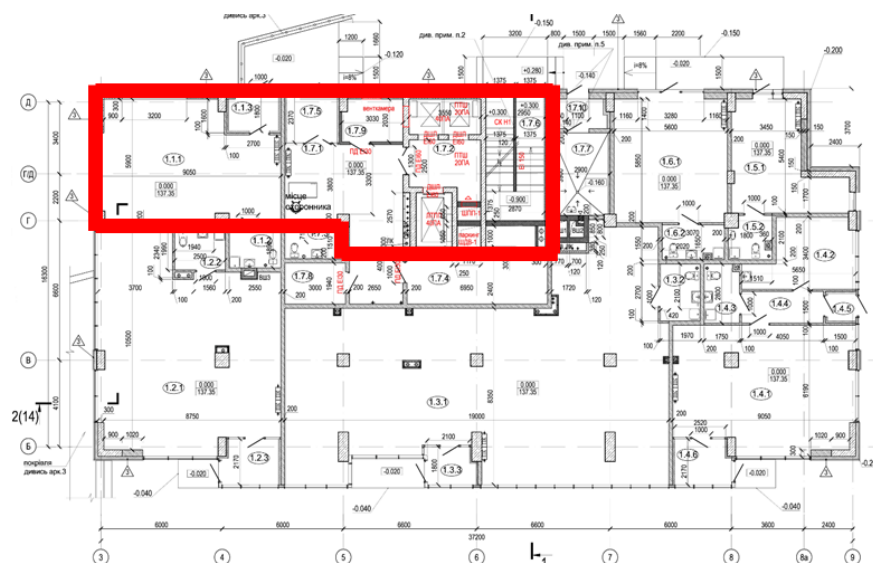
Building plan with the level difference zone (half-floor) highlighted, which requires special modelling in the calculation scheme
